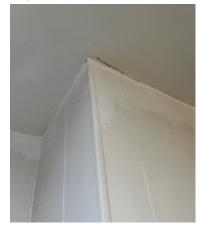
Continuous Ceiling Crack Around a Corner.
